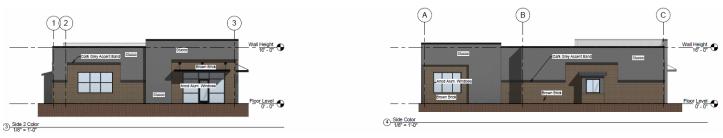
Restaurant/retail with drive-thru side elevation.
